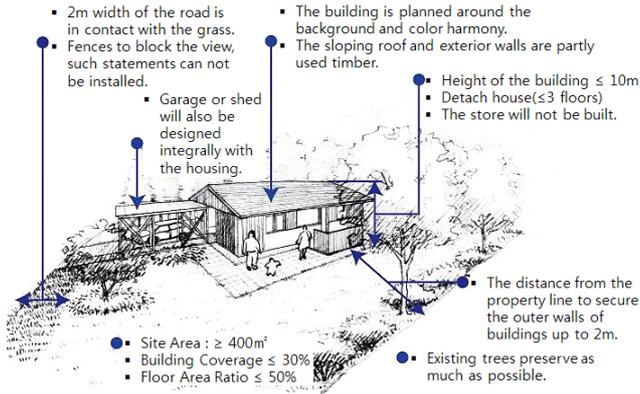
Architectural Guidelines (Source : Blessed Garden ENIWA Homepage, Japan)
